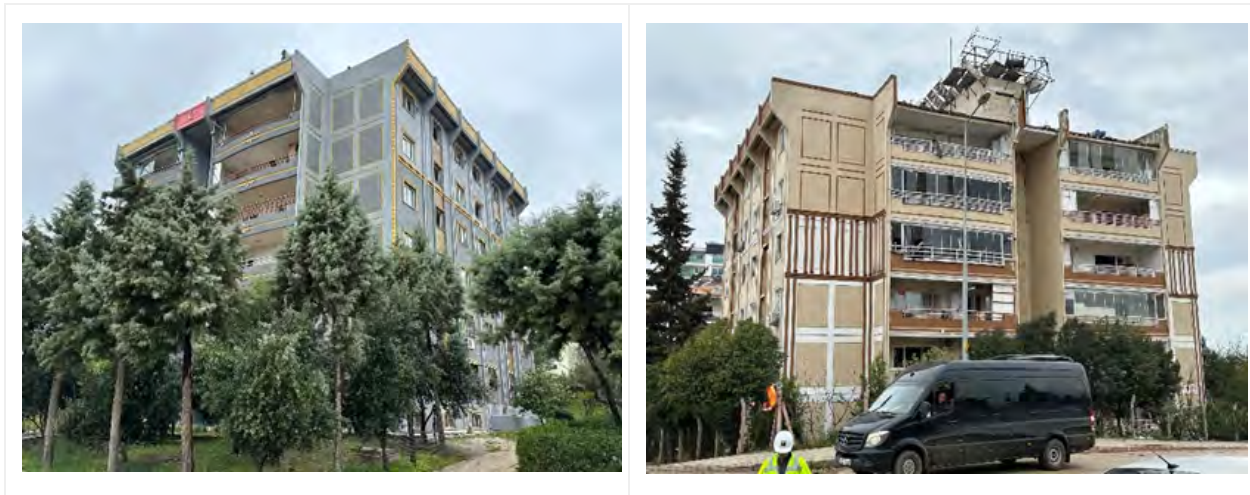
Residual lateral drift in a RC shear wall frame structure, Antakya, Hatay Province.
